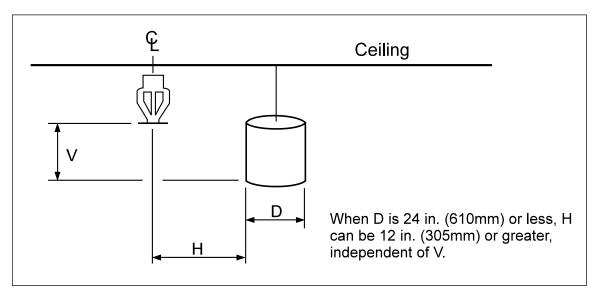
Round or rectangular obstructions below sprinklers < 24.0 in. (305 mm) wide.
